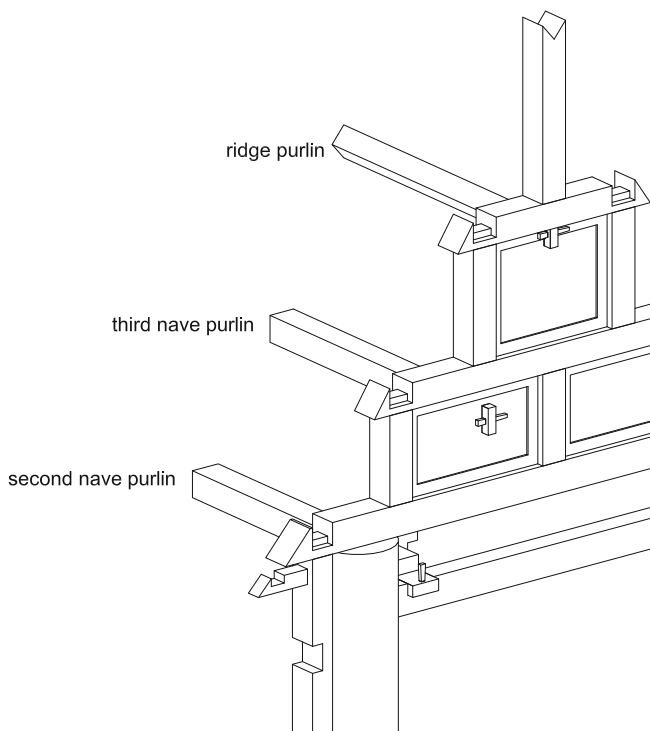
Purlins from the first bay meeting the second transverse frame in nave roof
